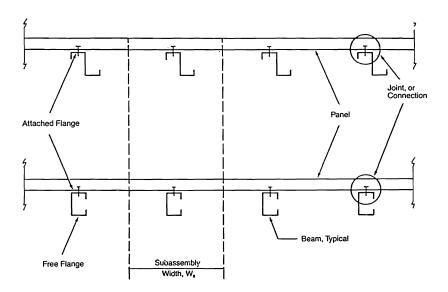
Wall, Floor, Ceiling, or Roof Assembly
